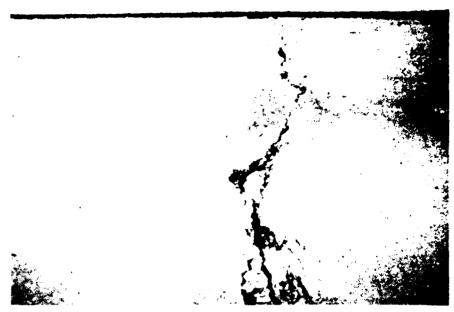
High severity transverse crack, jointed rigid pavement
